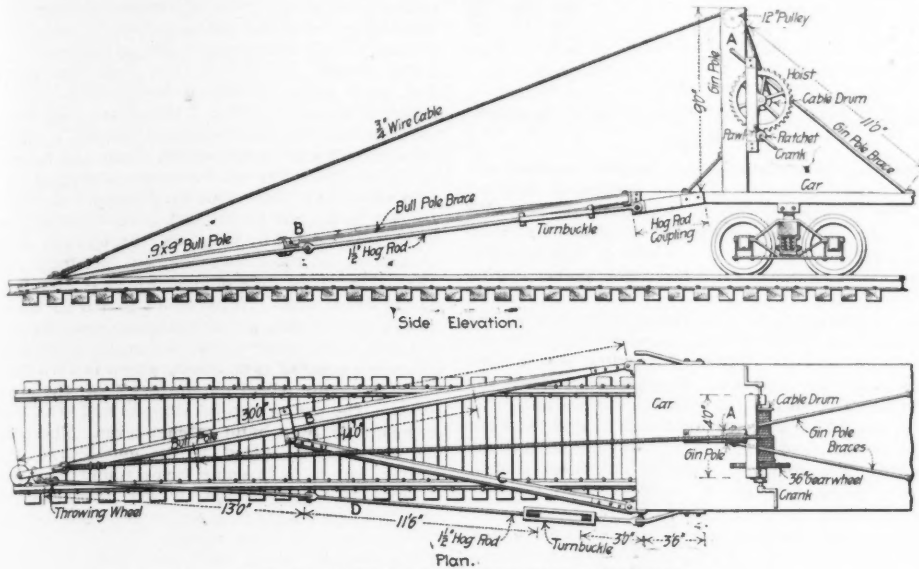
DETAILS OF TRACK-THROWING CAR.
